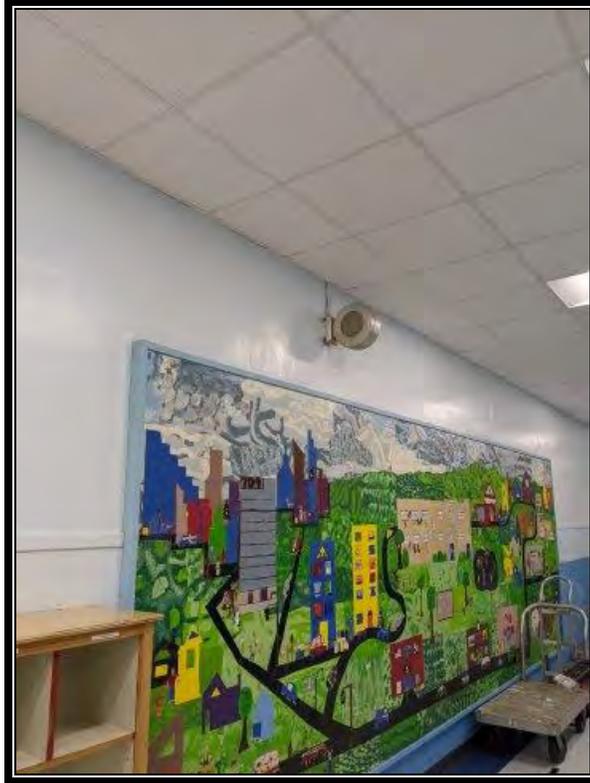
Non-ACM Wall Plaster and 2'x2' Ceiling Tiles (P.A. Speaker)
